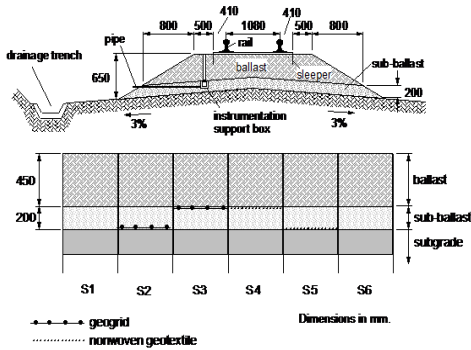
Typical railway cross section and experimental section arrangements (Fernandes *et al.*, 2008)
